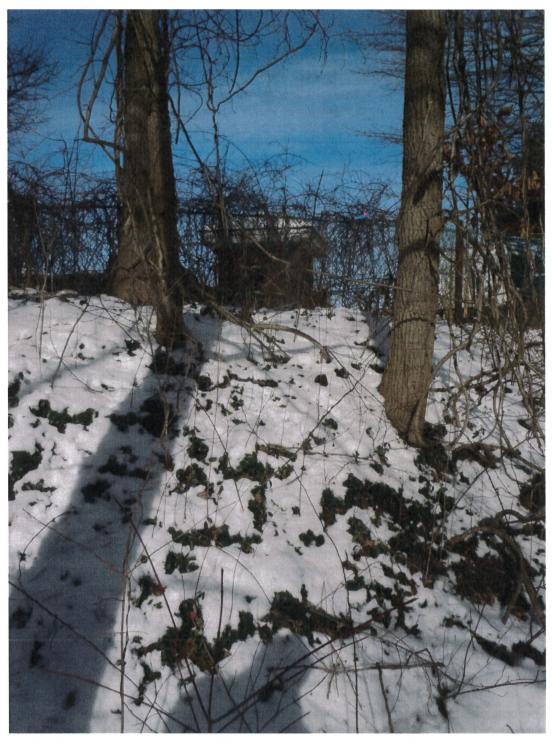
At river edge, looking northwest along existing pipe route (January 2016).
